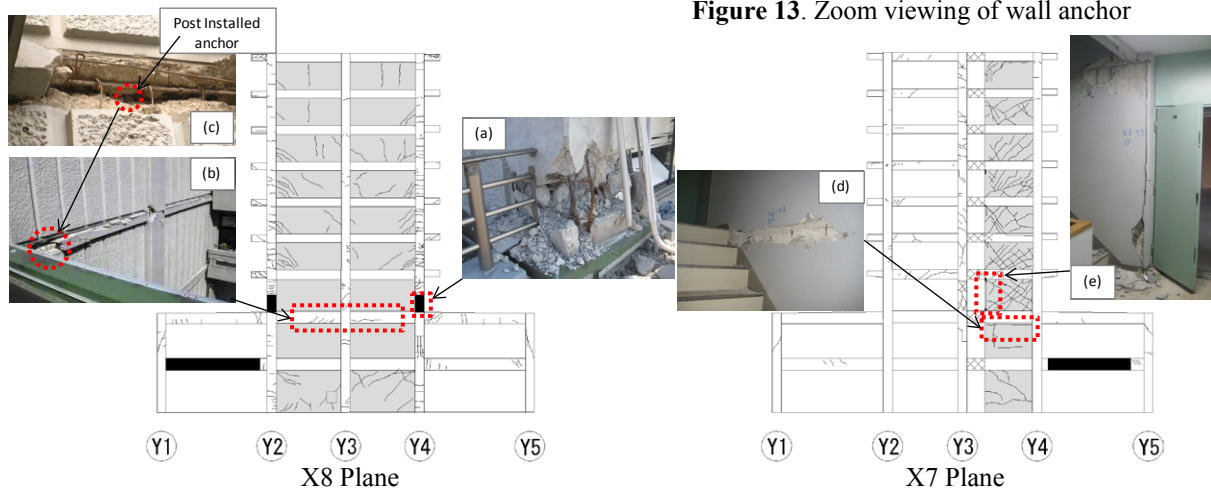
Crack patterns after 2011 Great East Japan earthquake
